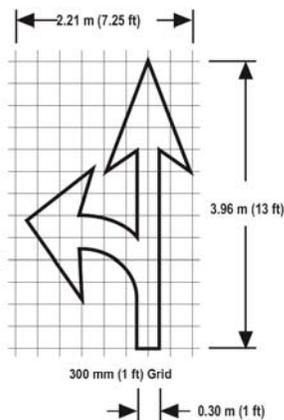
B-21 (CA). Examples of Arrows for Pavement Markings (Sheet 2 of 2)
